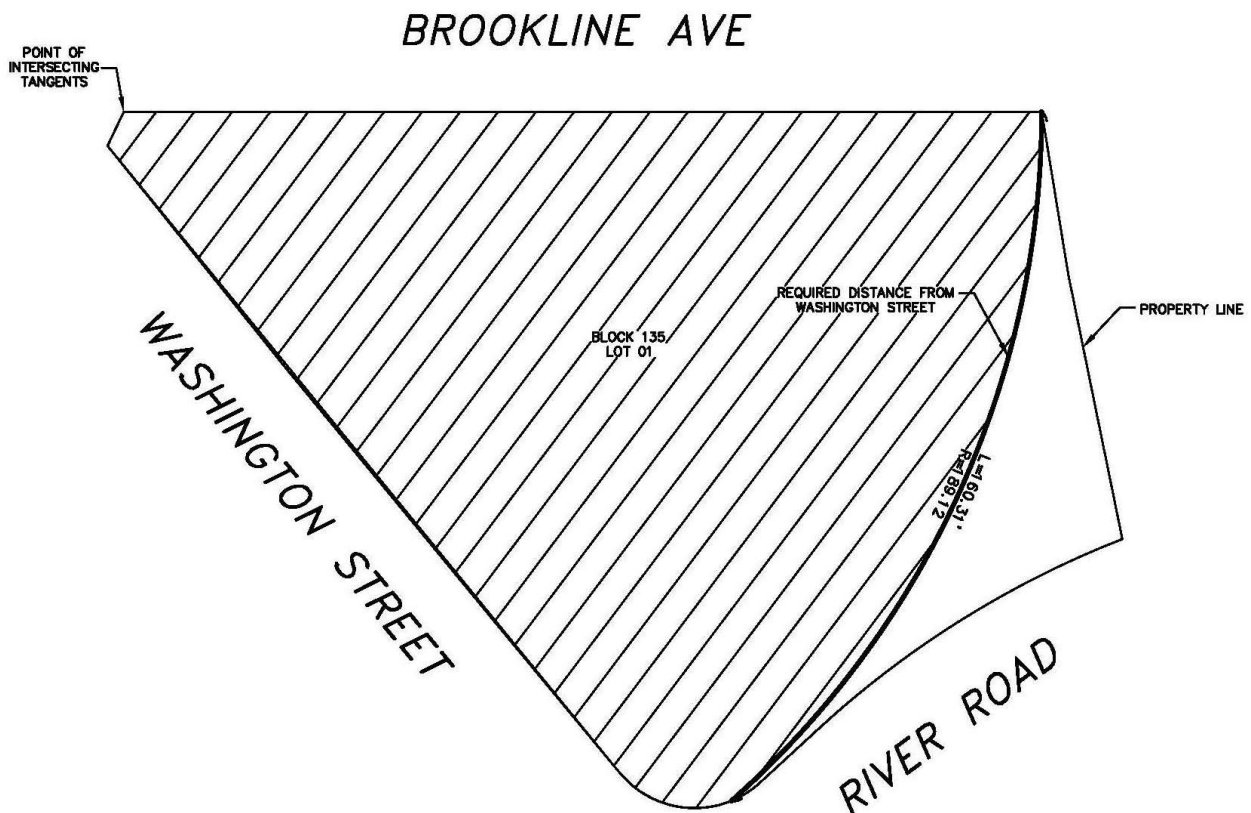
j.3 Required Distance from Washington Street
